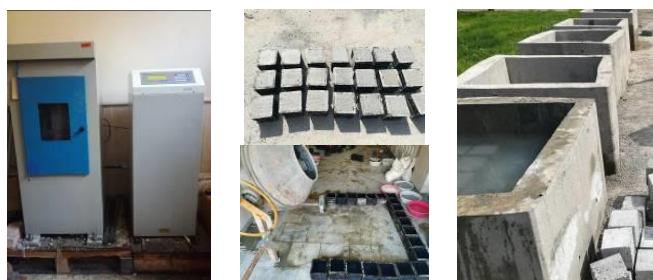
Construction of concrete pieces, curing tanks and used instruments
